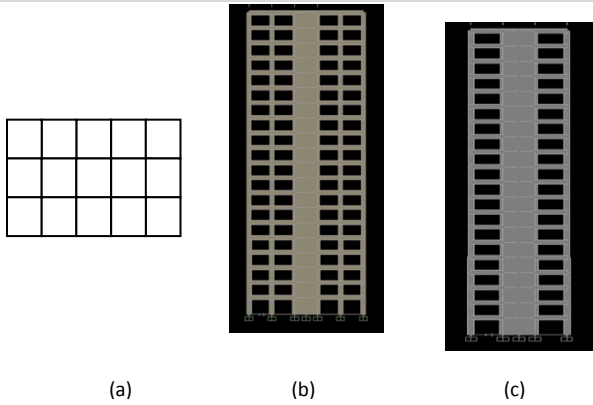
(a) Plan; (b) & (c) Elevation of shear wall in long and short directions.
